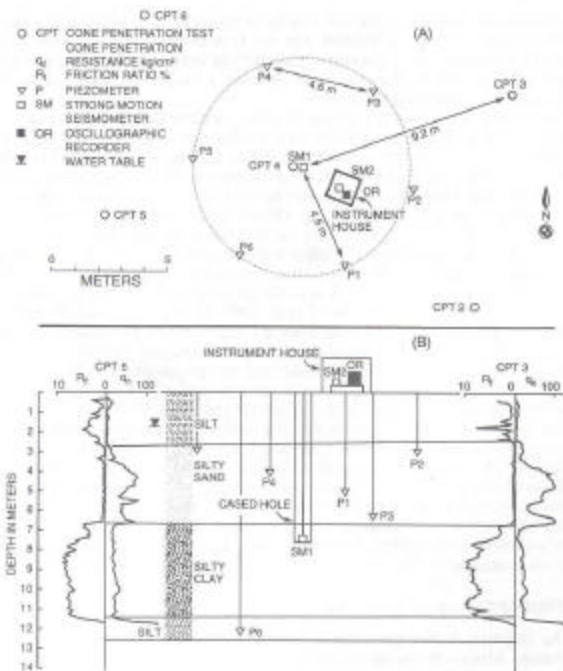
Plan and cross sectional views of instrumentation placed at Wildlife site in 1982 (Bennett et al., 1984)
